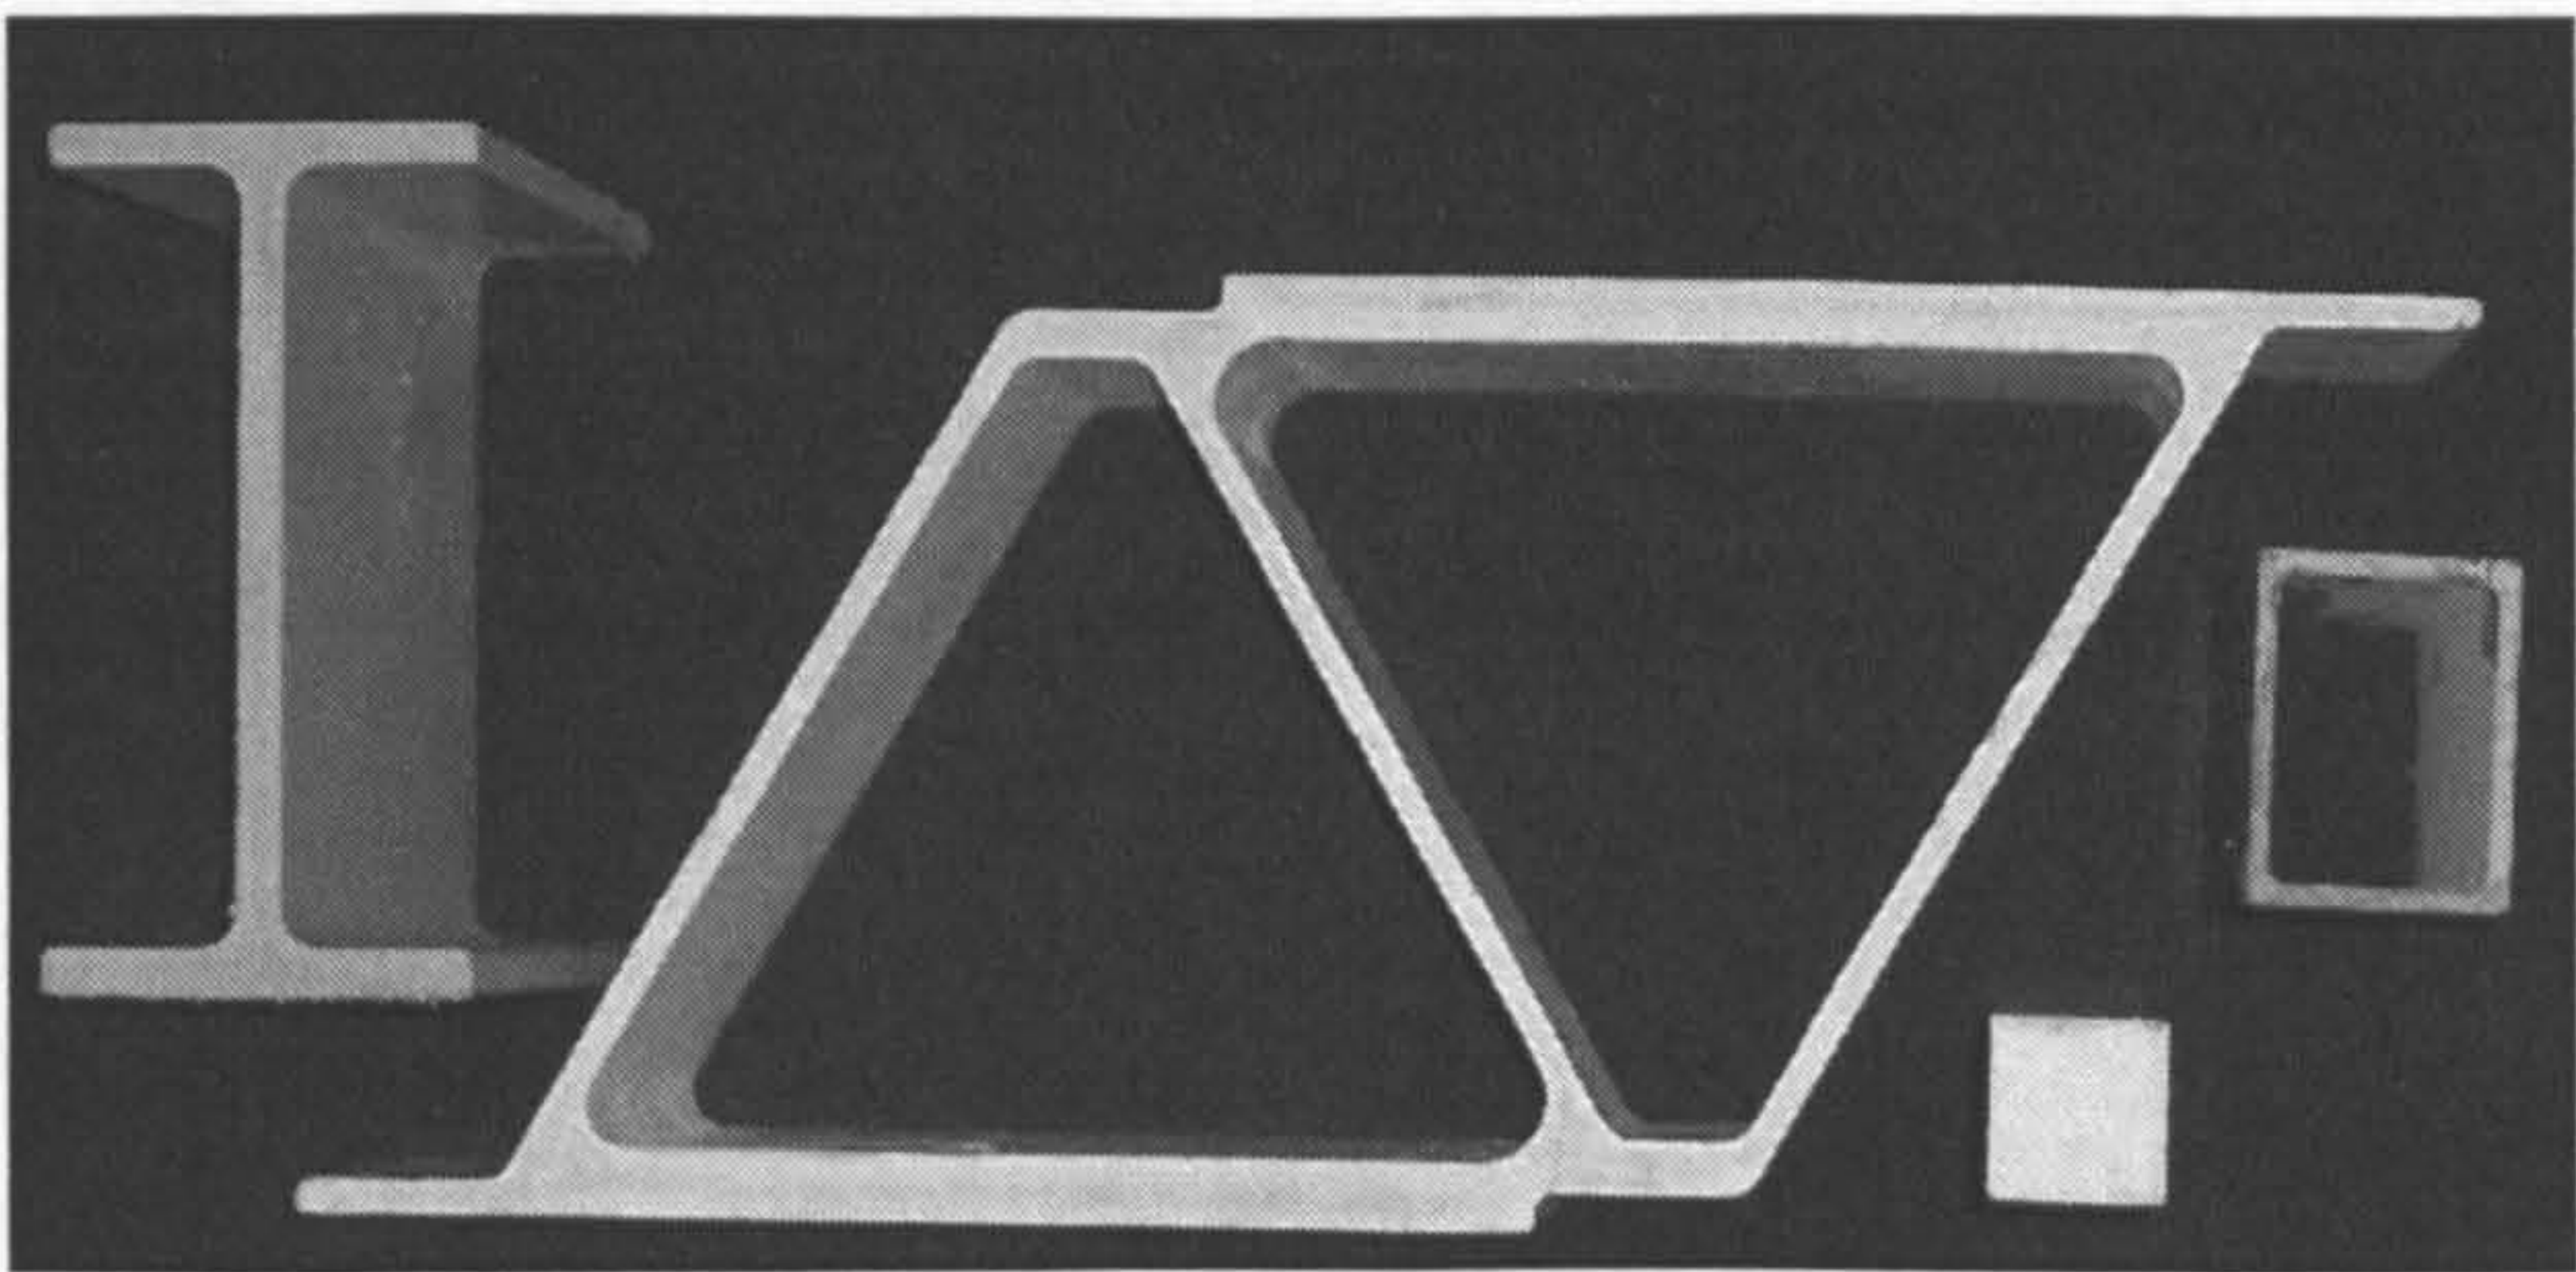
Typical pultruded profiles. The large profile in the centre was used in the construction of a road bridge.
